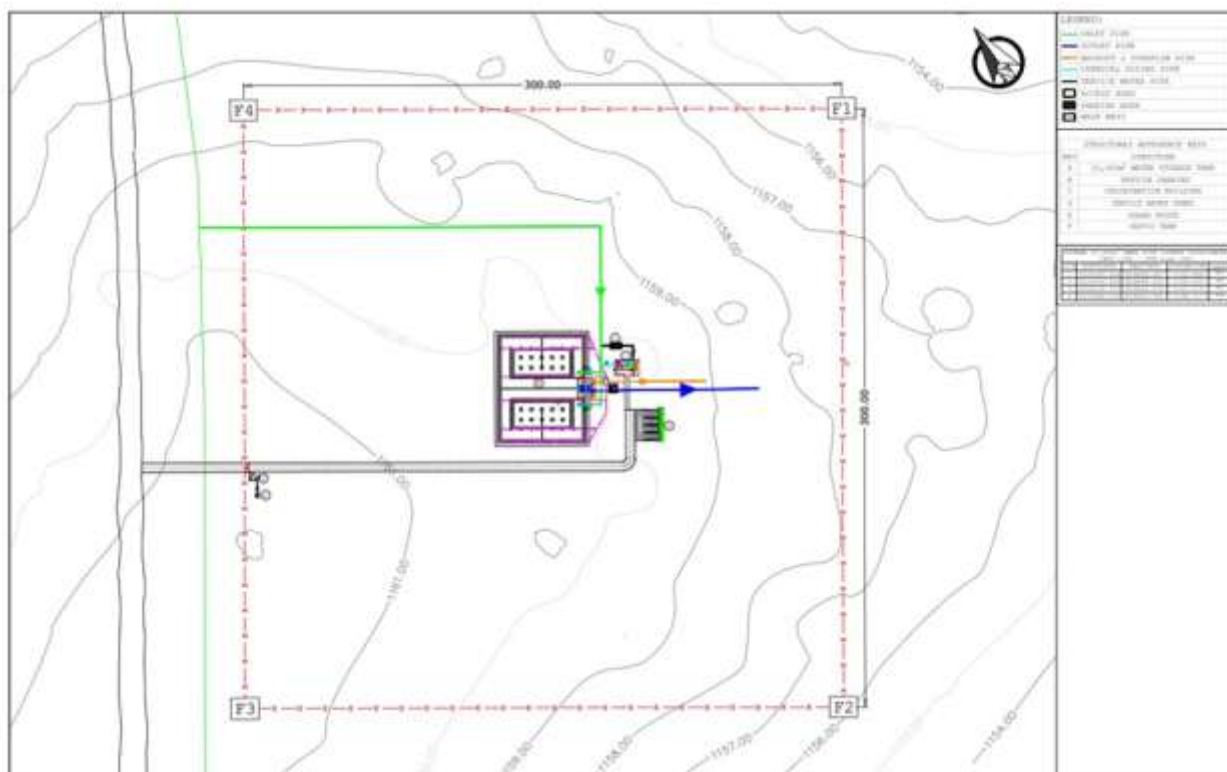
Bahi Storage Tank - Site Layout of 500 m3 Reservoir
